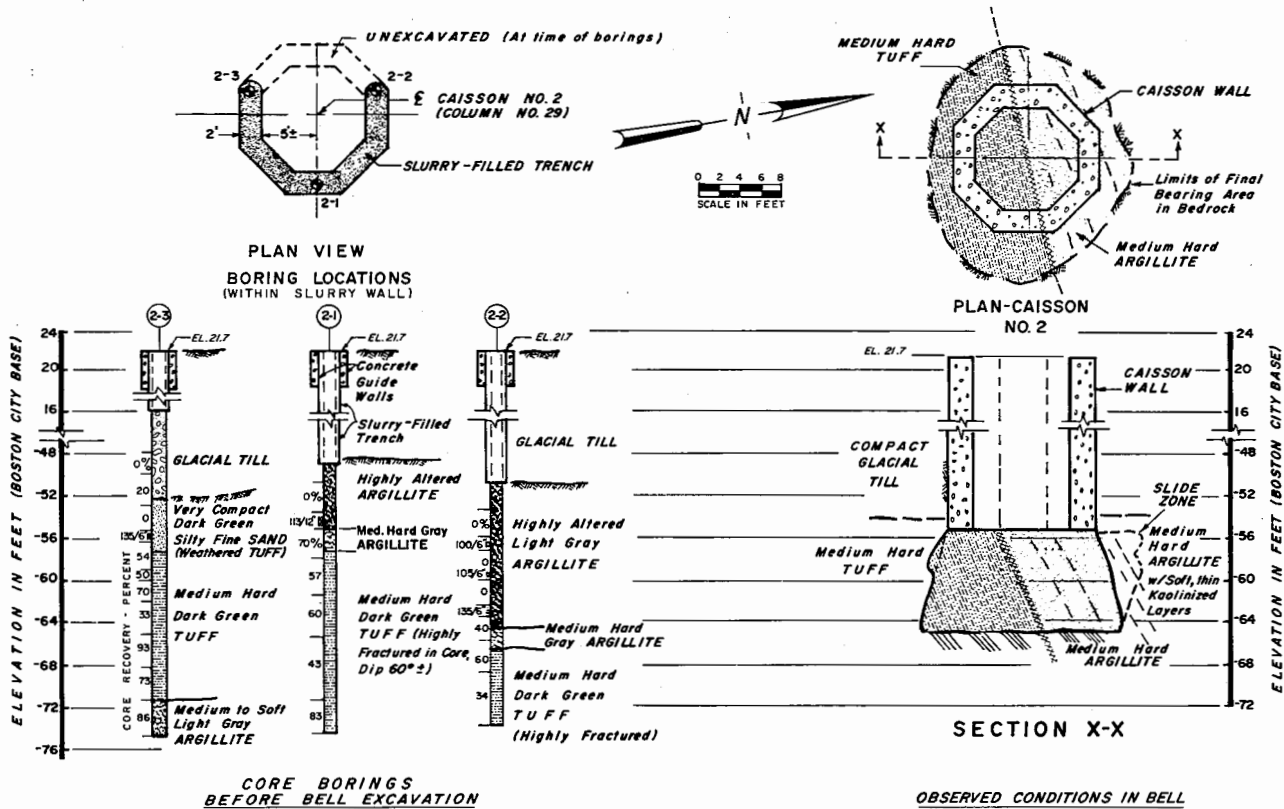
Details of Bedrock Conditions, Northeast Corner
